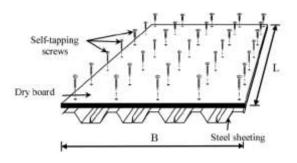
Profiled Steel Sheeting Dry Board (PSSDB) system [5]
